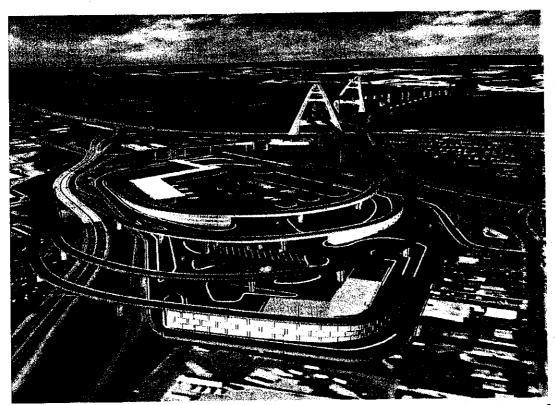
Proposed plaza layout in the United States (courtesy of Ambassador Niagara Signature Bridge Group).
